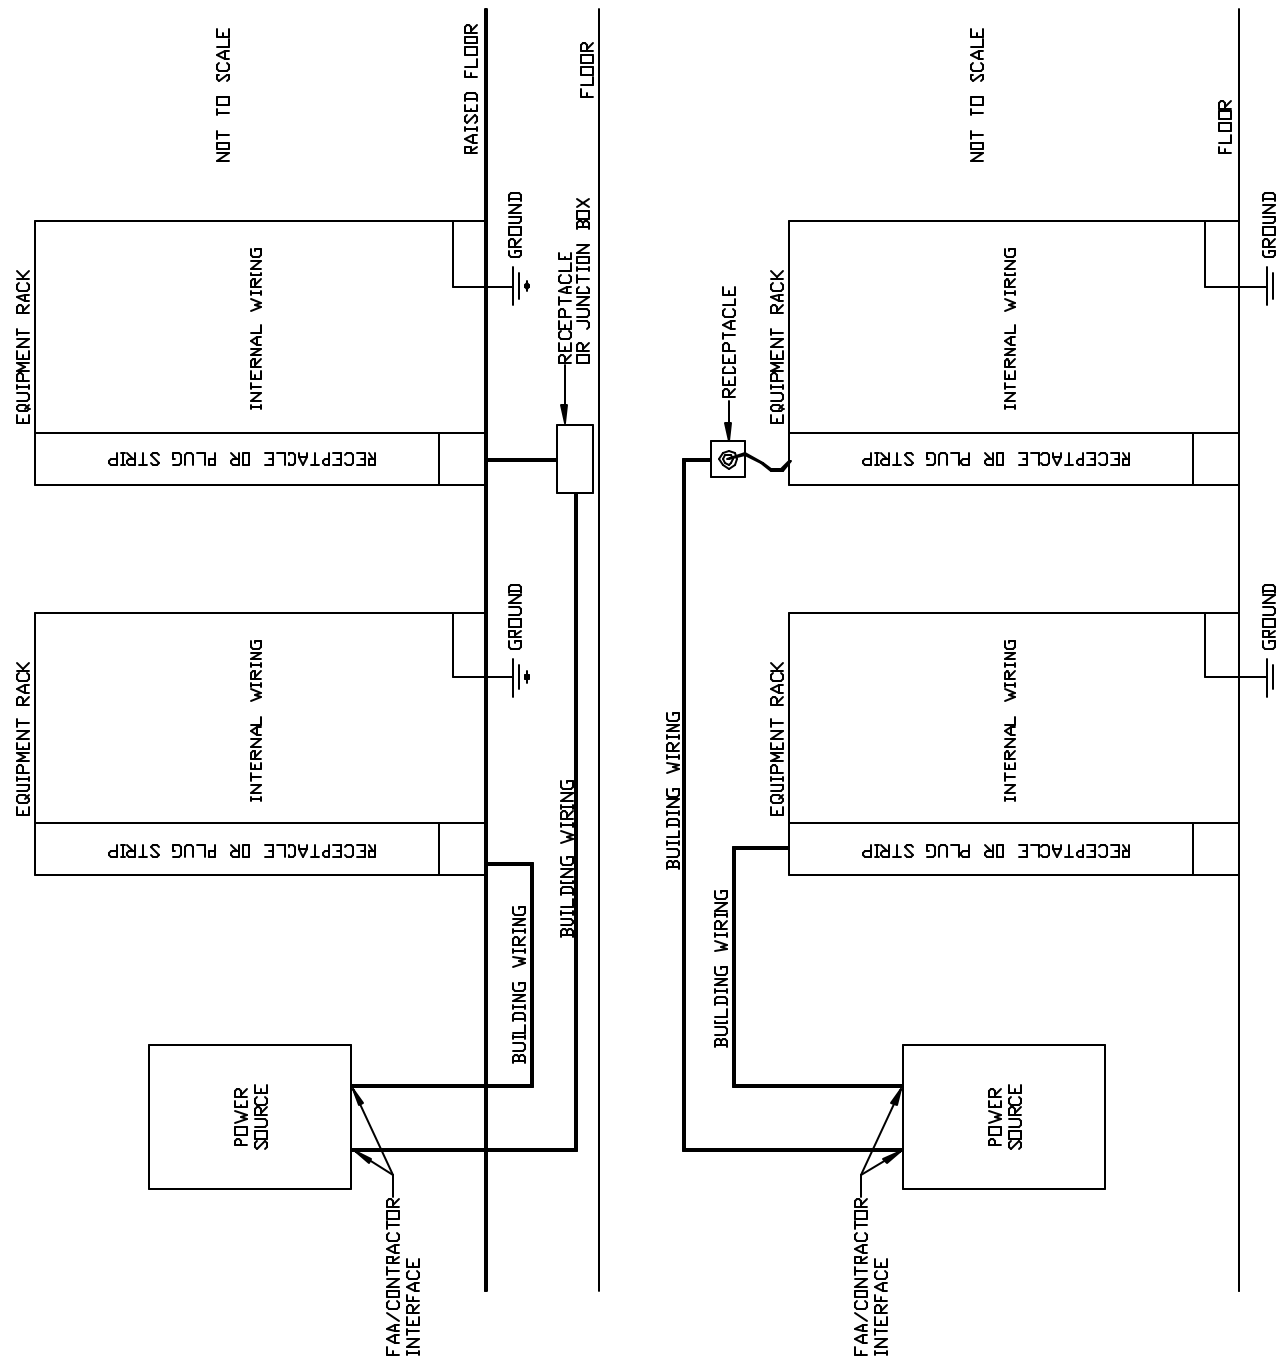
Internal/building Electrical Power Wiring Diagram
